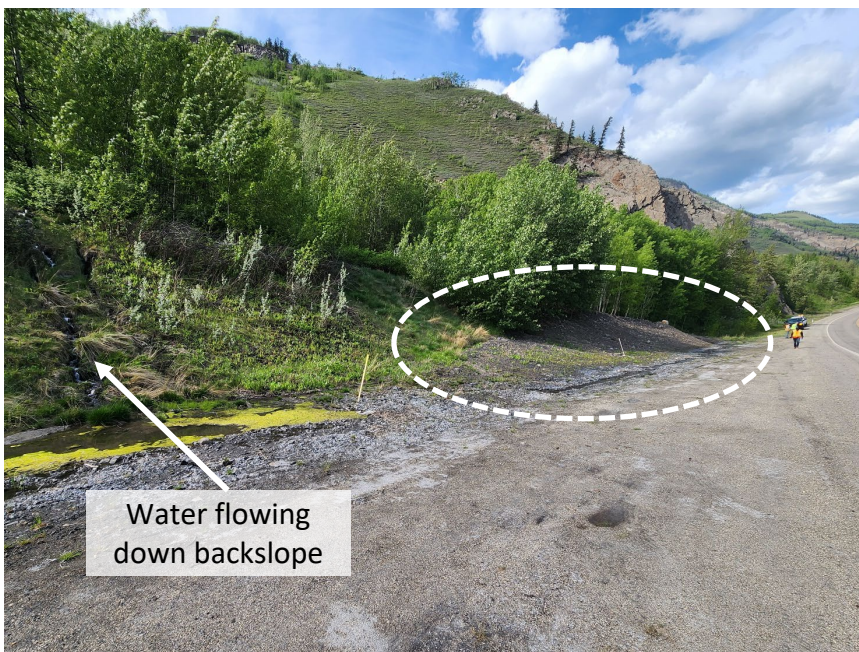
Debris flow material on west side of Hwy 40:36. Note flowing water in highway ditch. Photo taken June 2, 2025, facing southwest.
